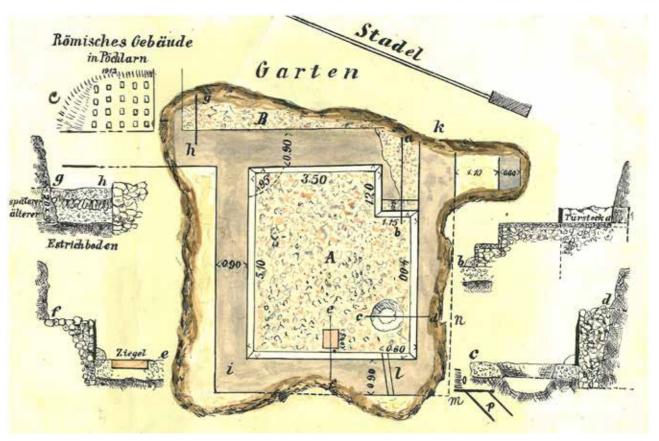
Pöchlarn/Arelape, excavation drawing from 1913 (Archive BDA)
